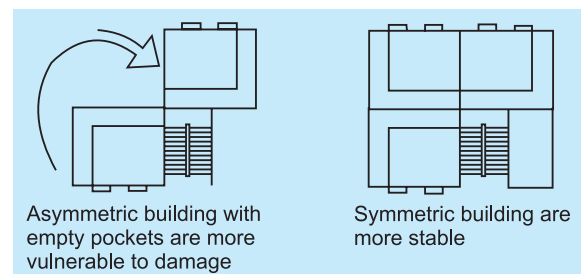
Desirable orientation & plan form for reducing wind damage.
